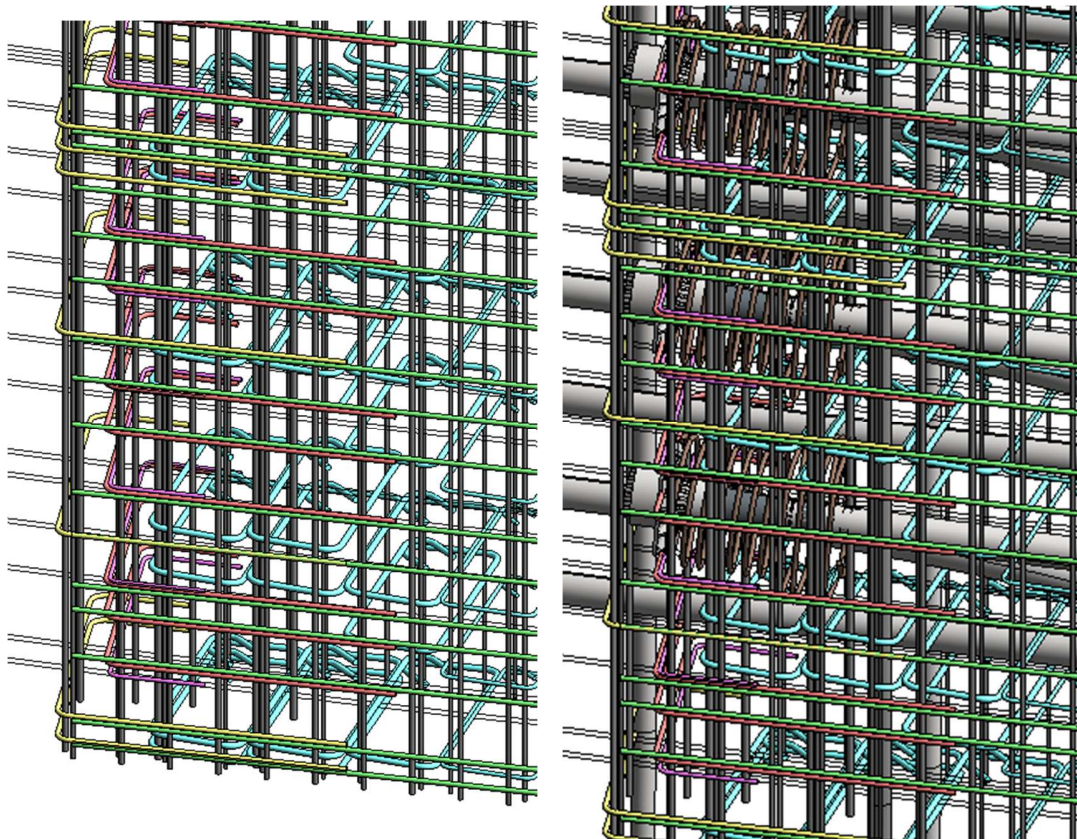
LEVEL OF DETAIL FOR BUTTRESS REINFORCEMENT
